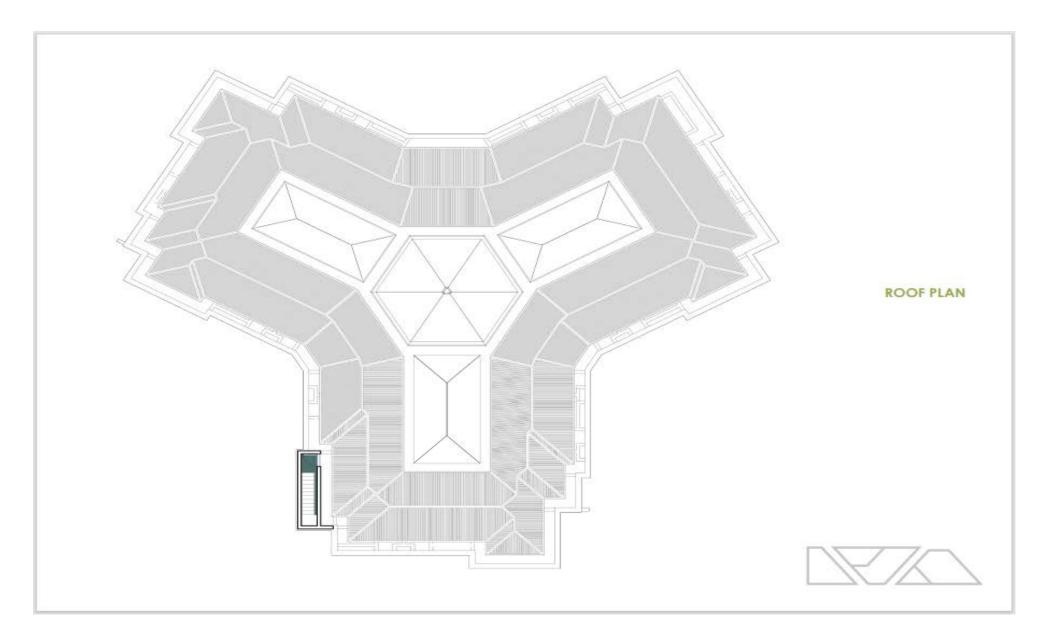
Proposed Roof Plan of the ACEPHAP Project
